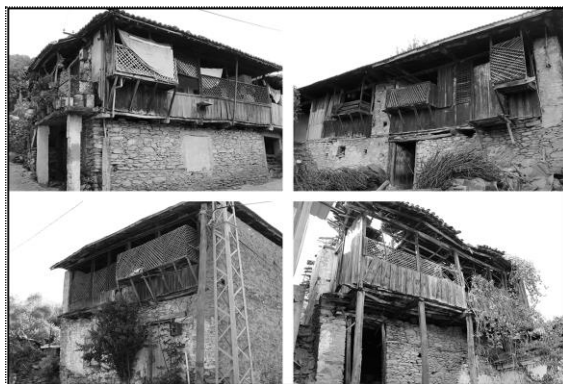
Examples of Wooden Cages on the Facades of Buildings.
